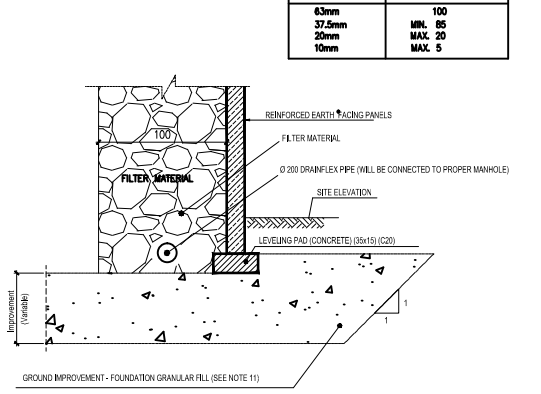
DETAIL - B RIGHT CURB APPLICATION WITH REINFORCED EARTH® WALL
